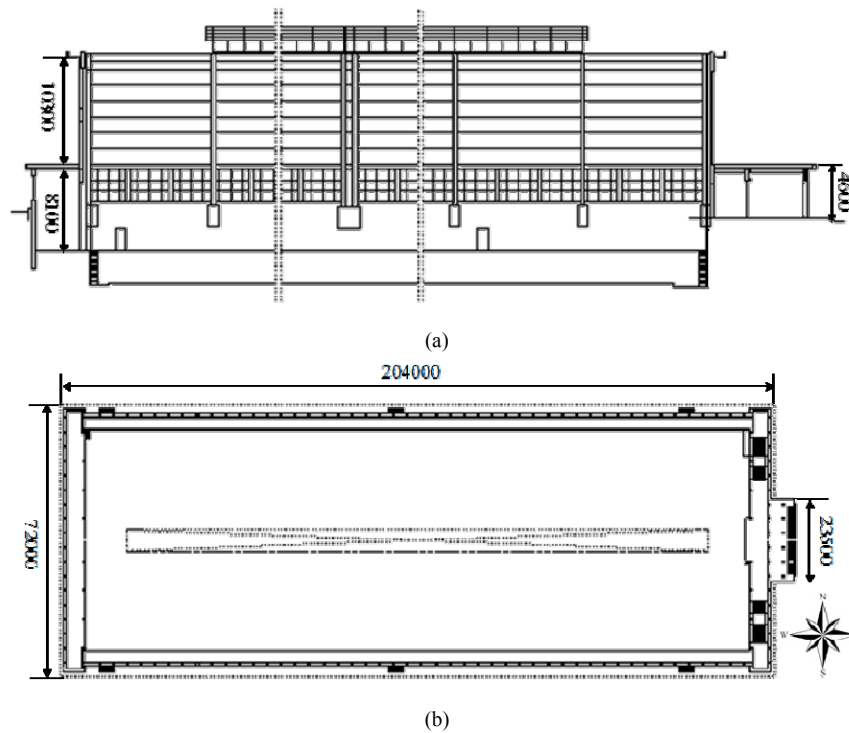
The first hall of Terra-cotta Warriors and Horses Museum: (a) elevation view; (b) plan view
